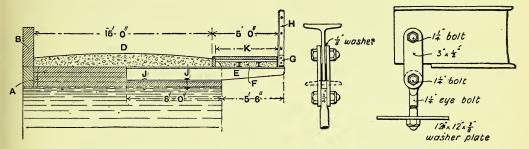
Section of Viaduct showing Footway supported by Cantilevers.
